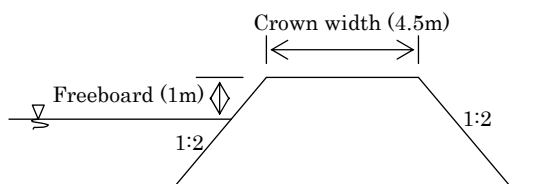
Proposed Layout of the Lower Nyando River Improvement Works
